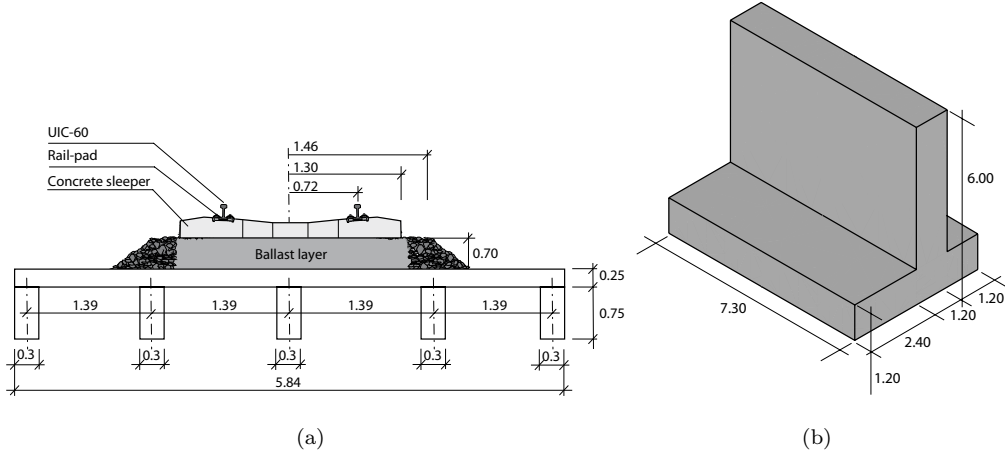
(a) Deck cross-section. (b) Abutment geometry.
